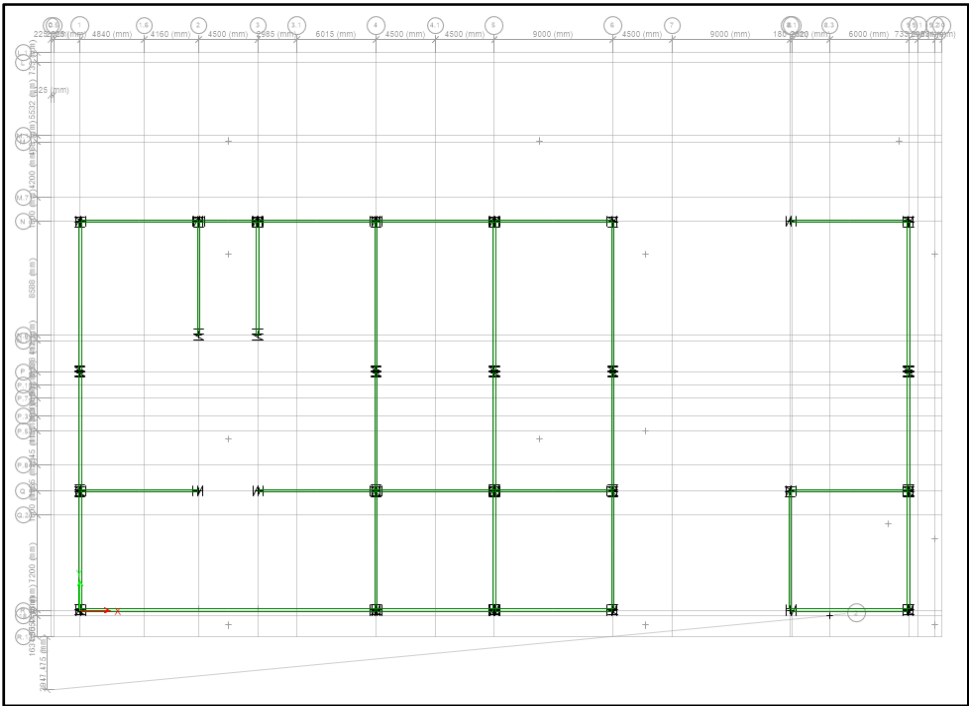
Plan view of masonry walls in the (3rd, 4th, and 5th floor)
